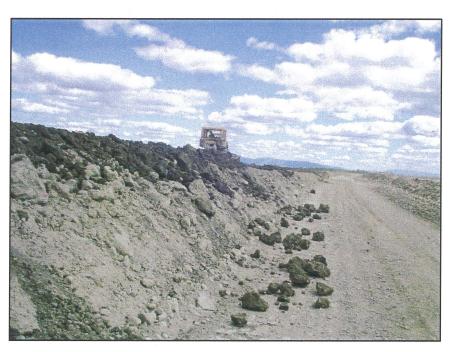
0.3 m lift of Zone S placed on the Perimeter Embankment.
